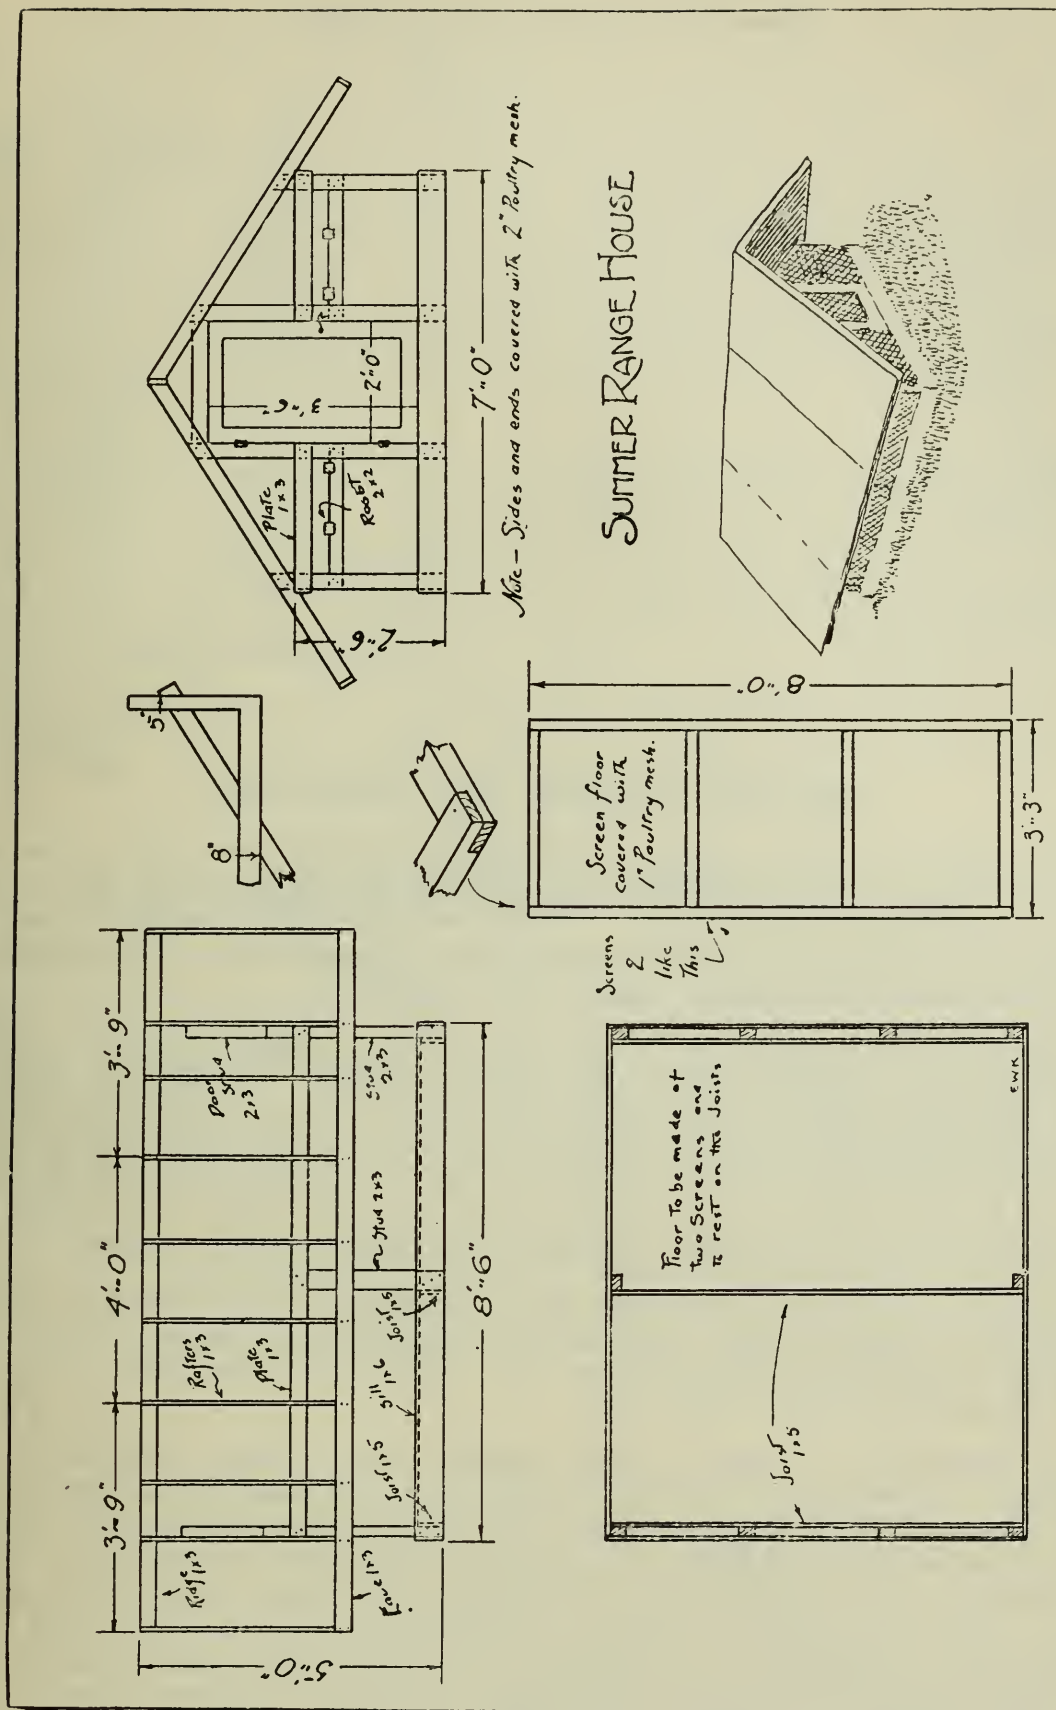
Plans and construction detail for Range Shelter shown in Fig. 74.
